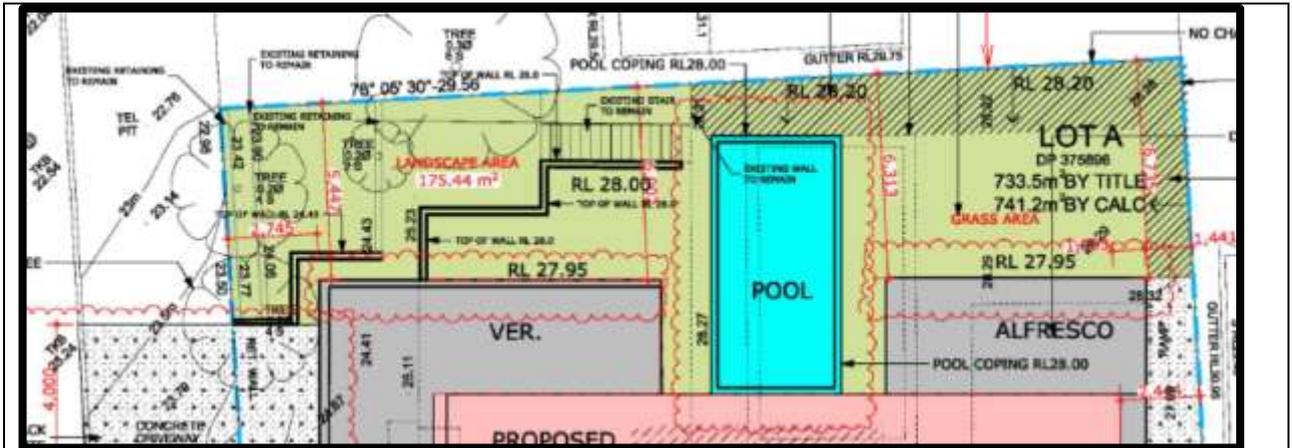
Extract of site plan (Source: David Dechiara, 2020).
